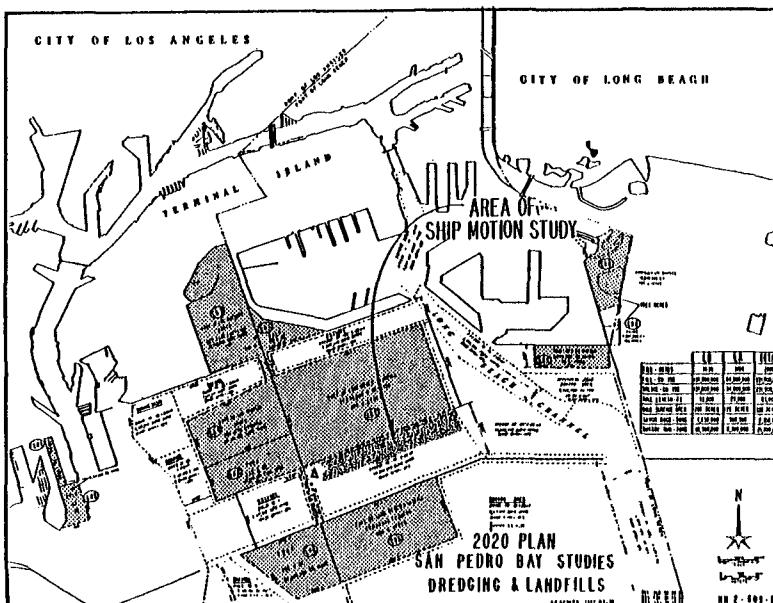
2020 Plan – San Pedro Bay Studies – Dredging and Landfills
